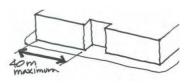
Limit the visual mass of building façades to lengths of 40 m or less.
